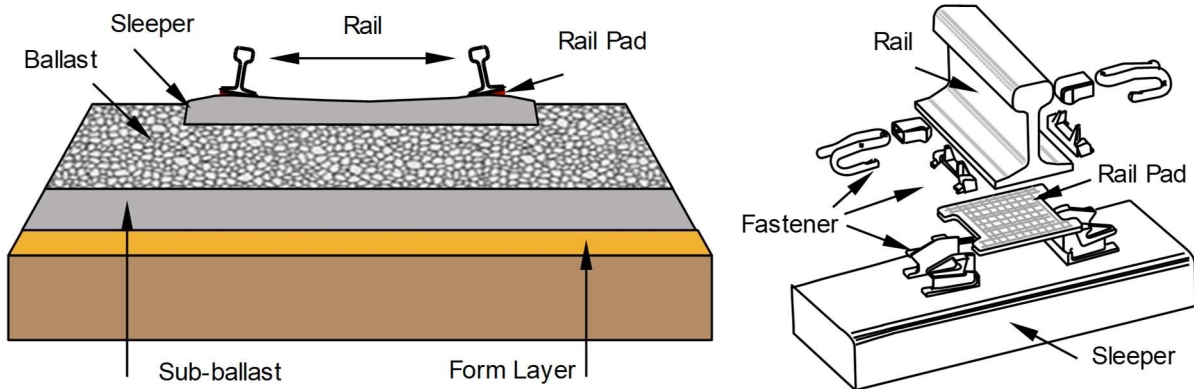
Typical construction of a railway track with its structural components: a) Track including the ballast and substructure b) Exploded view of the fixation of the rail to the sleeper
